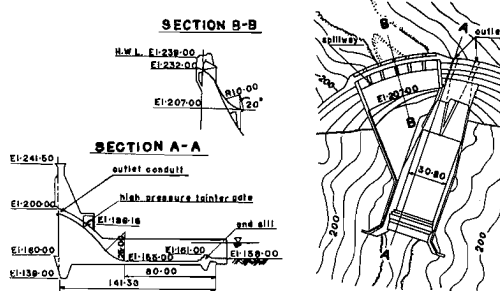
Spillway and stilling basin works for Yuda Dam.
